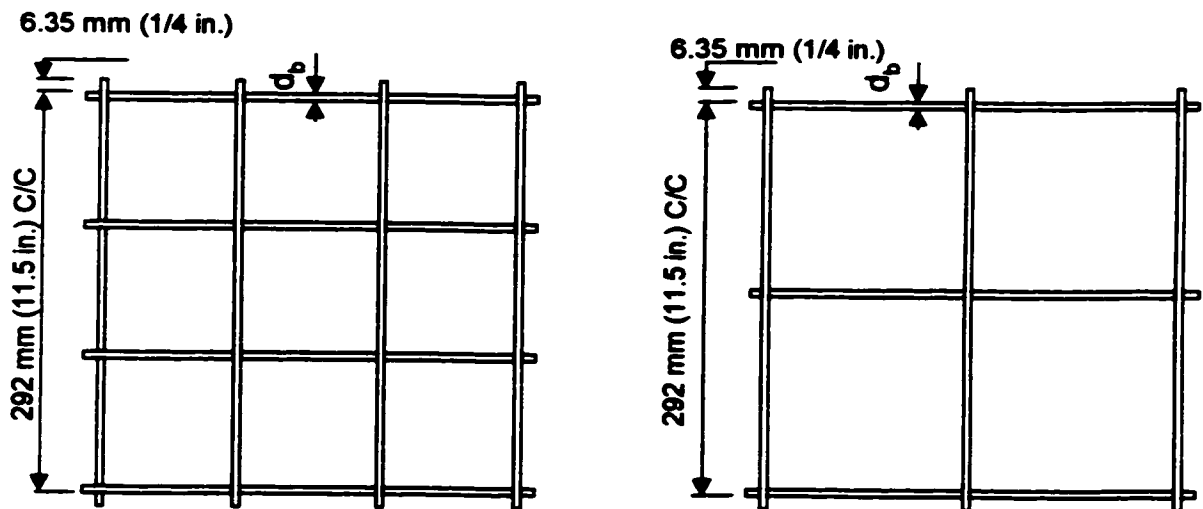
Geometric details of Welded Reinforcement Grids
